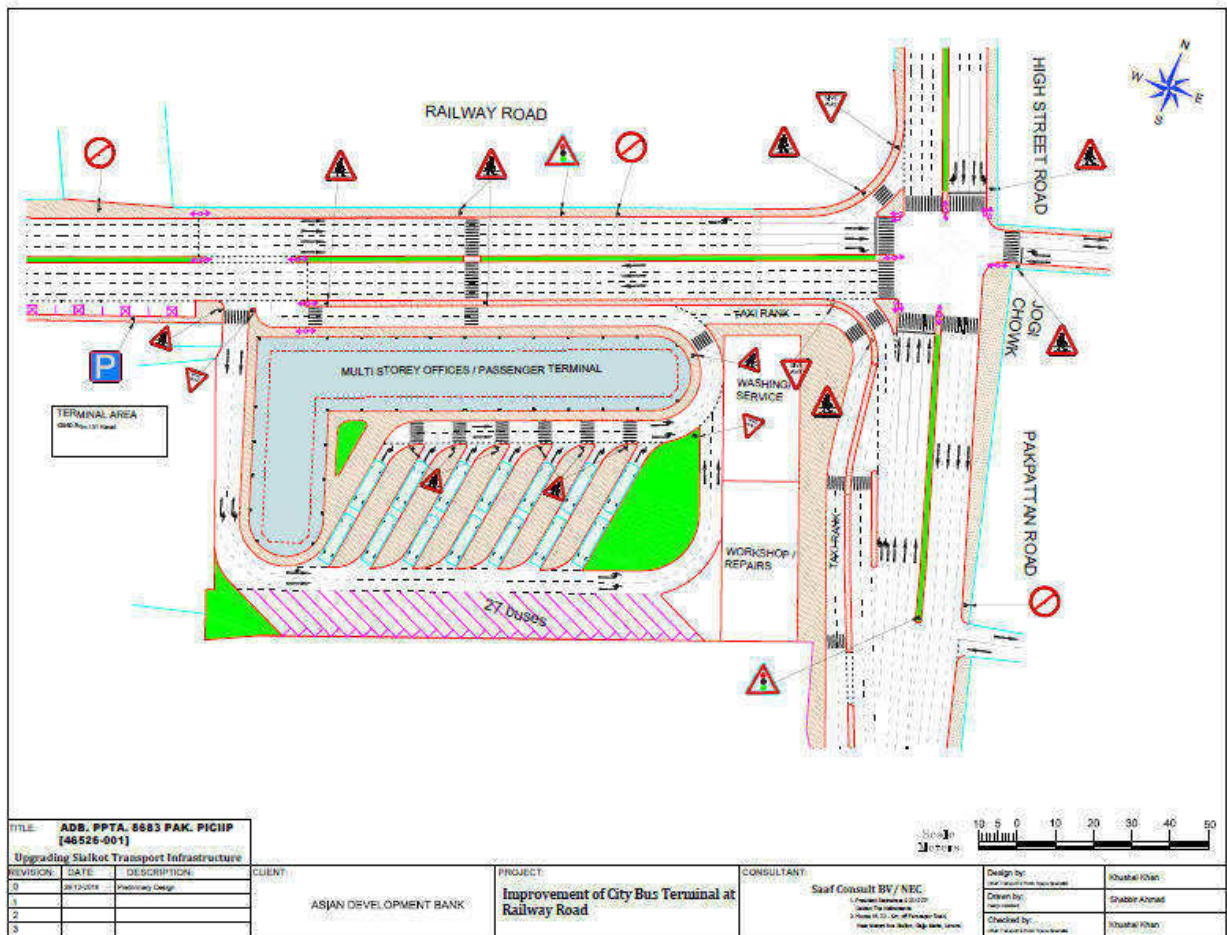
Proposed Layout of Railway Road Bus Stand
